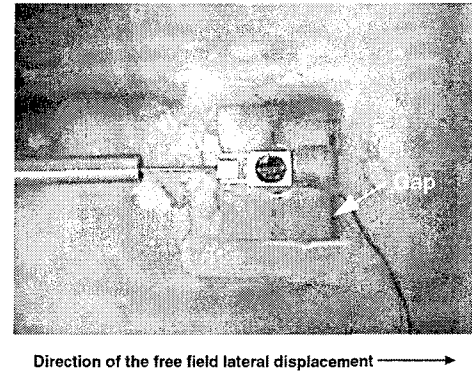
Plan view of retrofitted pile cap and ground after the test, Model 2r1 (Wang, 2001)
